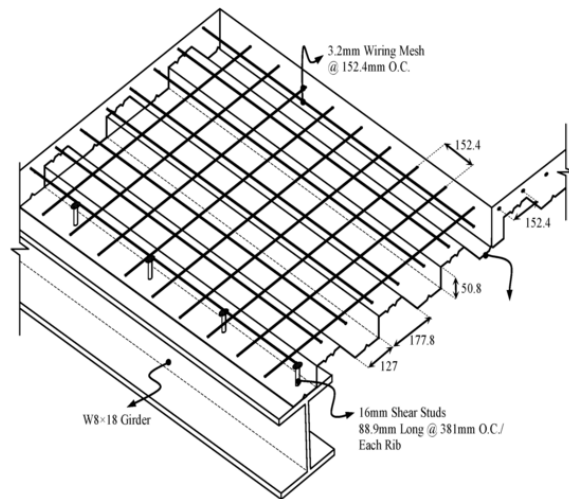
Slabs reinforced with welded wire reinforcement.
